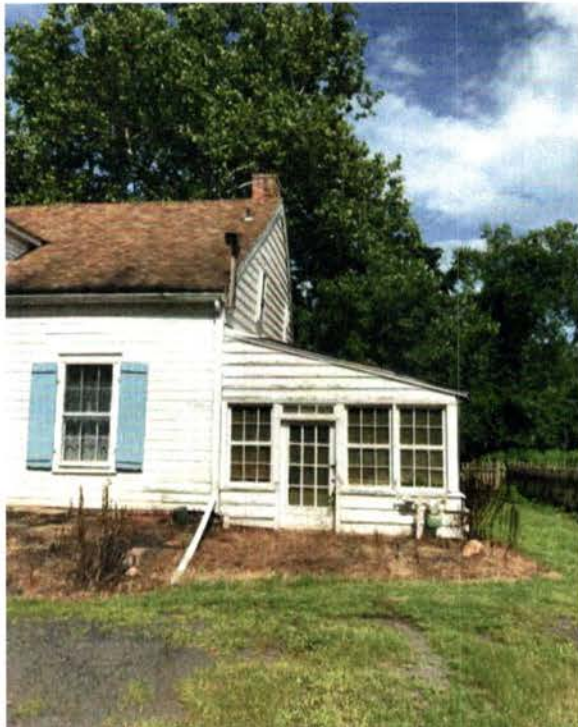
West elevations of Build A1 (left) and Hothouse or Build D (right). The exterior light fixture at the SW corner of the house and gas meter near the SW corner of the Hothouse should be relocated. The house's south gable (oblique plane above and to the rear of Build D) appears to lean out at the ridge.
